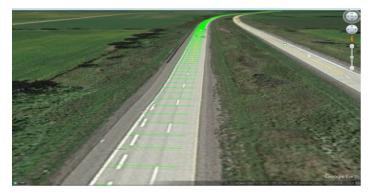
Joints of concrete pavement annotated by green horizontal lines on Google Earth image.
